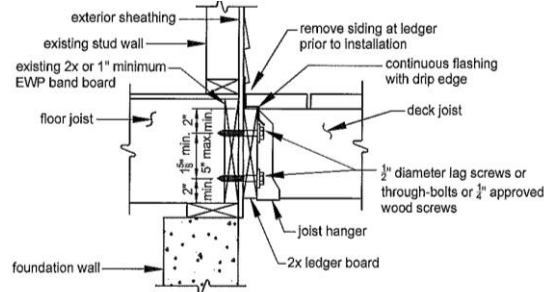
LEDGER BOARD-TO-BAND BOARD ATTACHMENT
